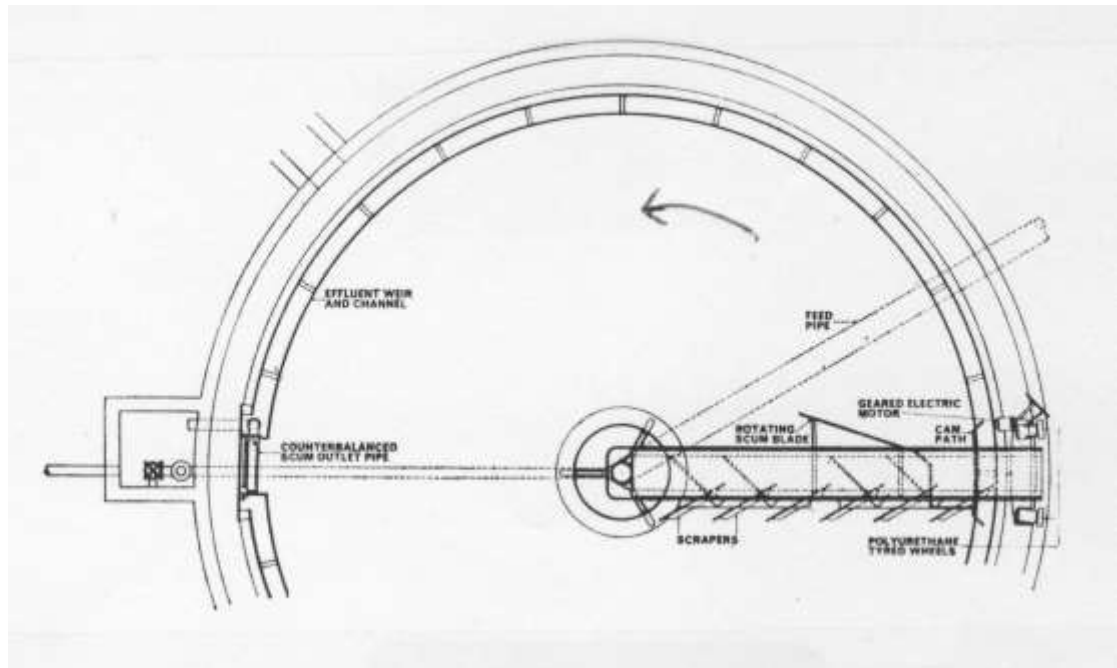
SLUDGE SCRAPERS IN ECHELON LAYOUT.
